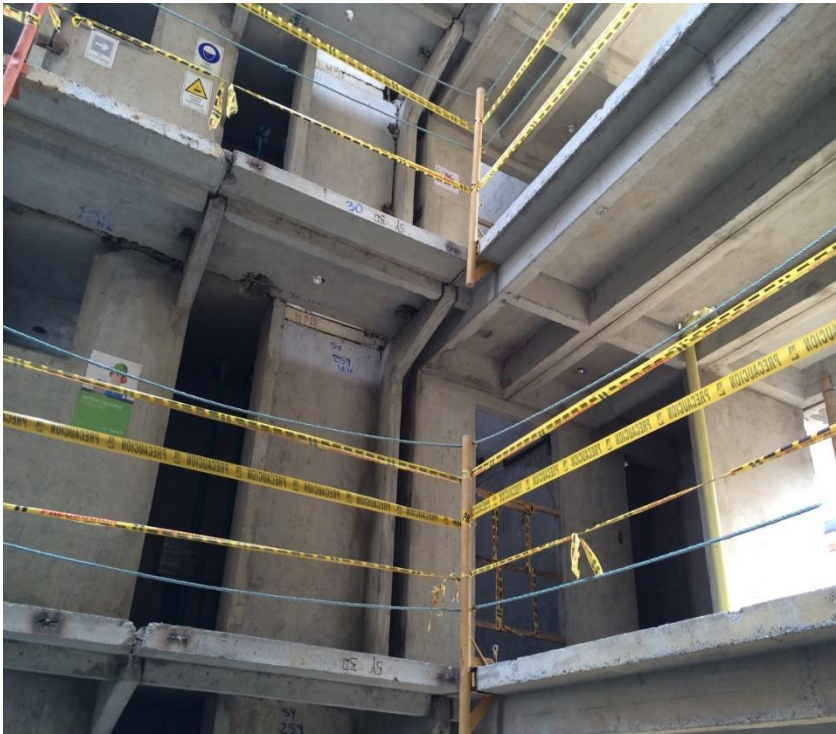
Interior view of *Sayab* structure, based on demountable prefabricated reinforced concrete panels.
